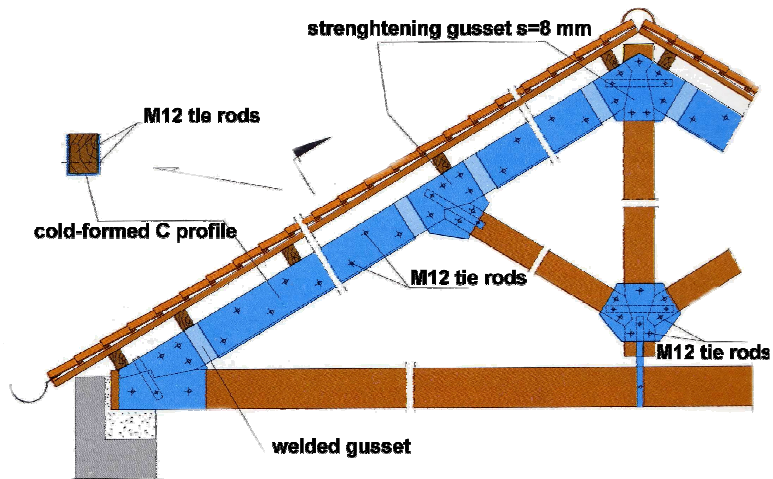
Repairing a wooden roof structure by using steel plates (Mazzolani) [159]
